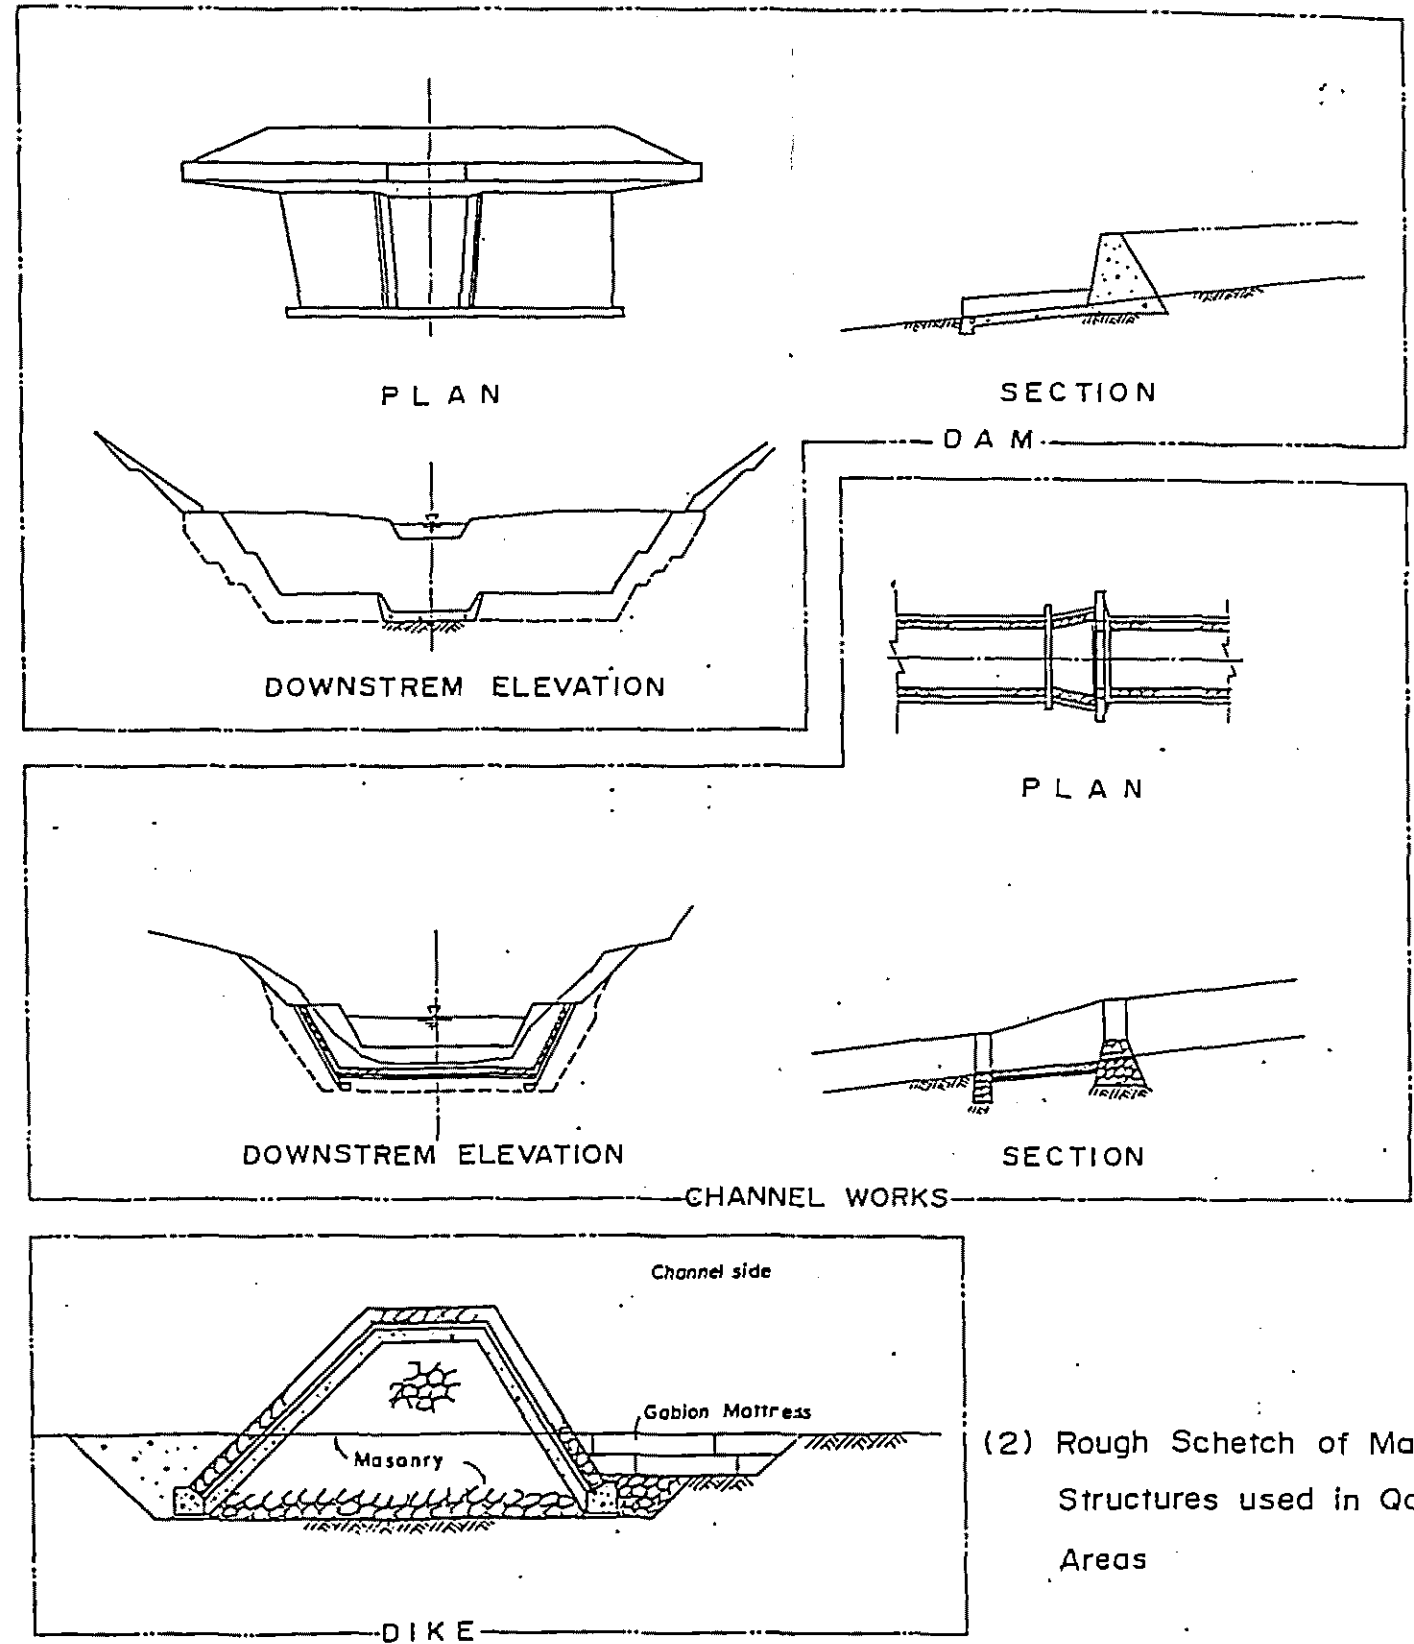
Type of Proposed Structural Plan for Qda Areas
